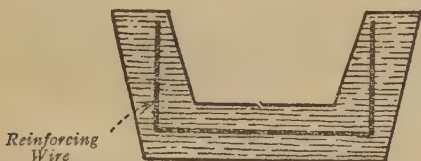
SECTION THROUGH BIRD-BATH OF CAST CONCRETE
